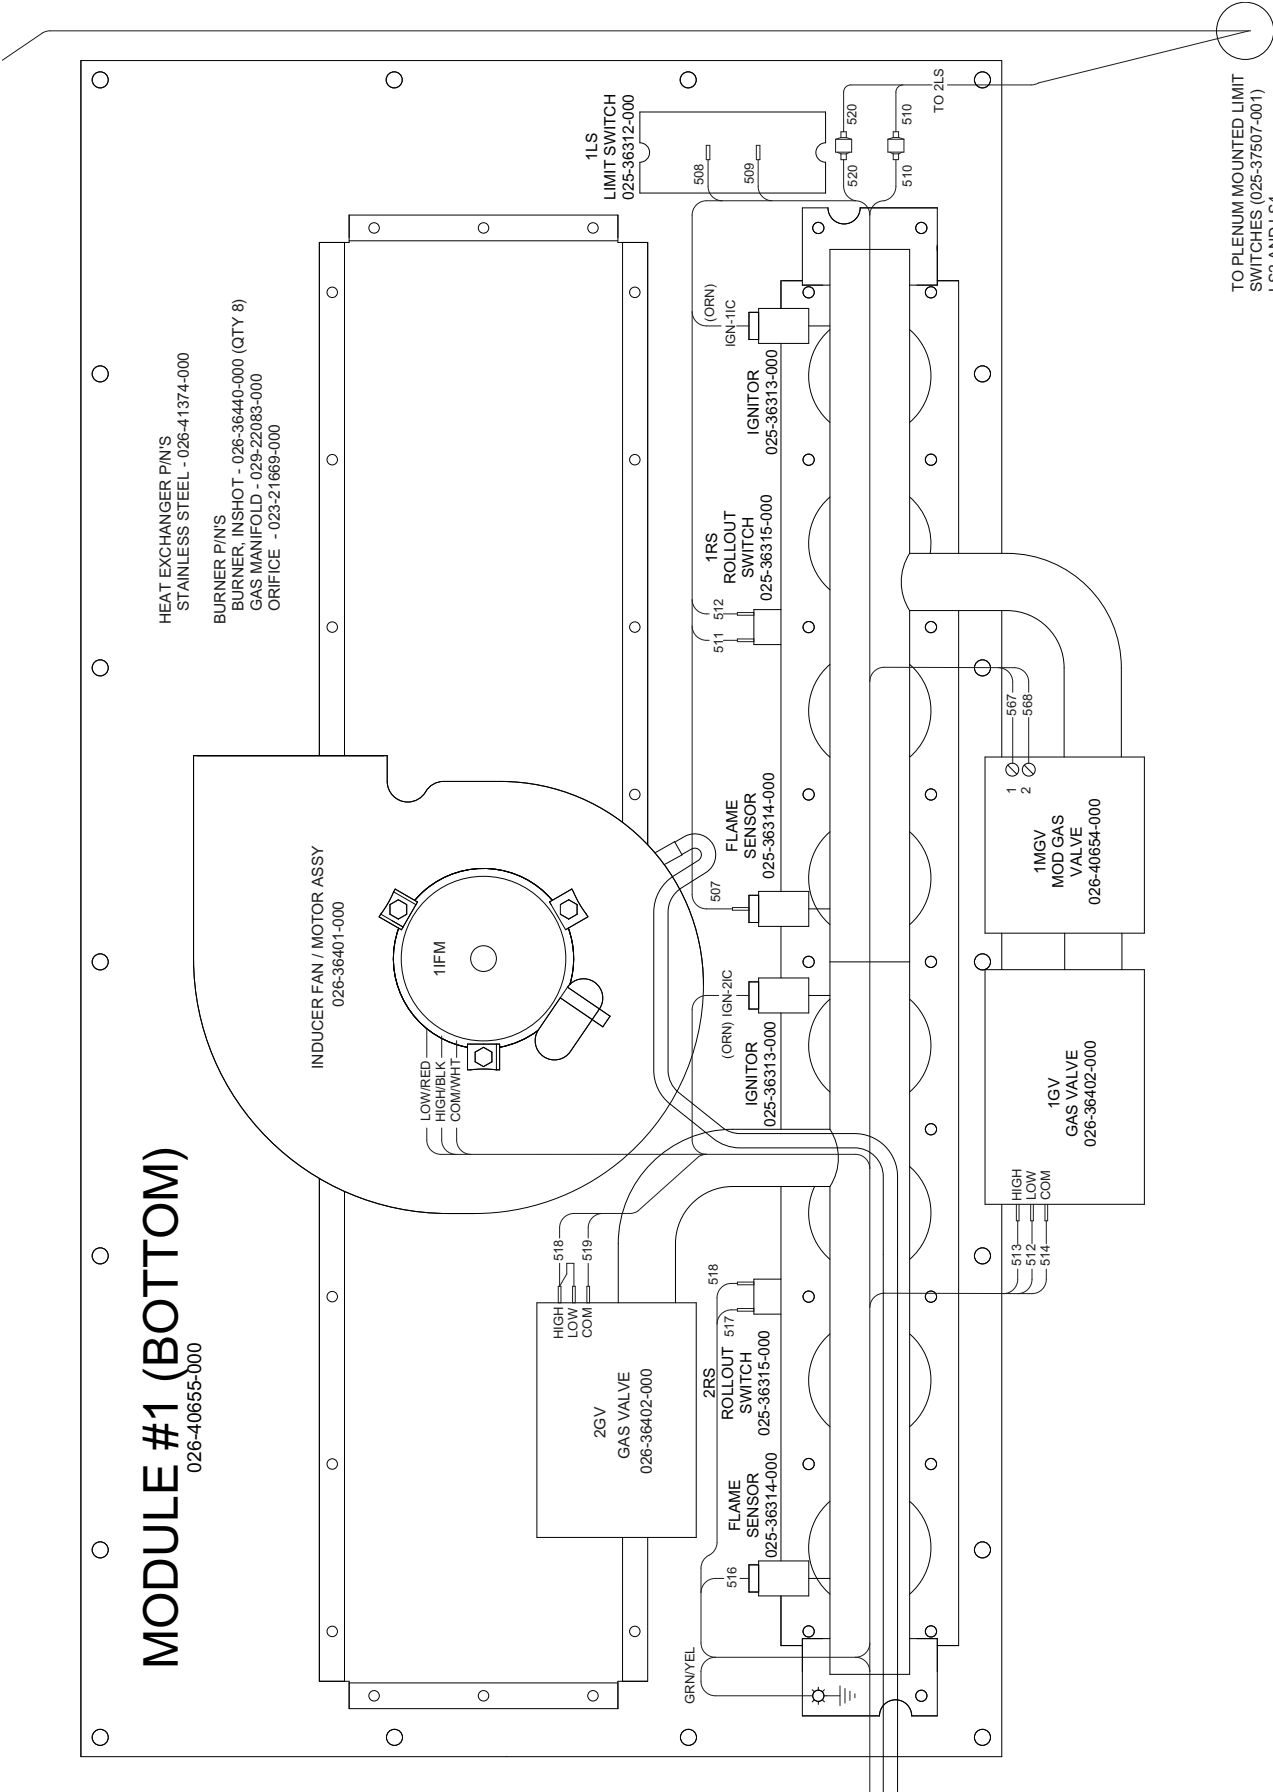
YPAL, 50-65 TON, MOD D, GAS HEAT (ENLARGED VIEW #5)
